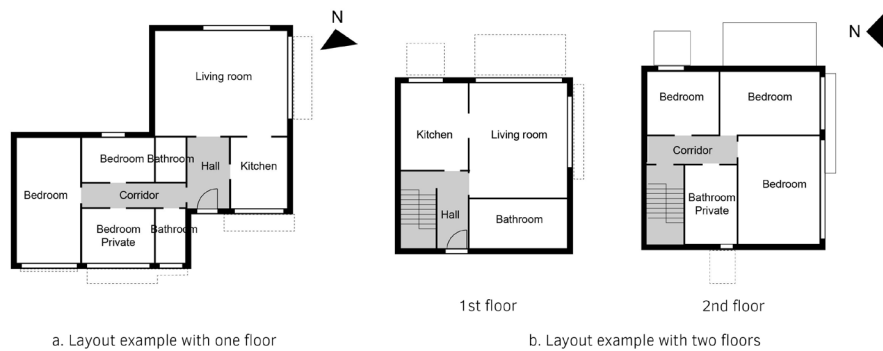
Examples of two layout sets in [69] (left: layout with one floor, right: layout with two floors). The interior partitions divide the layout into different thermal zones.
